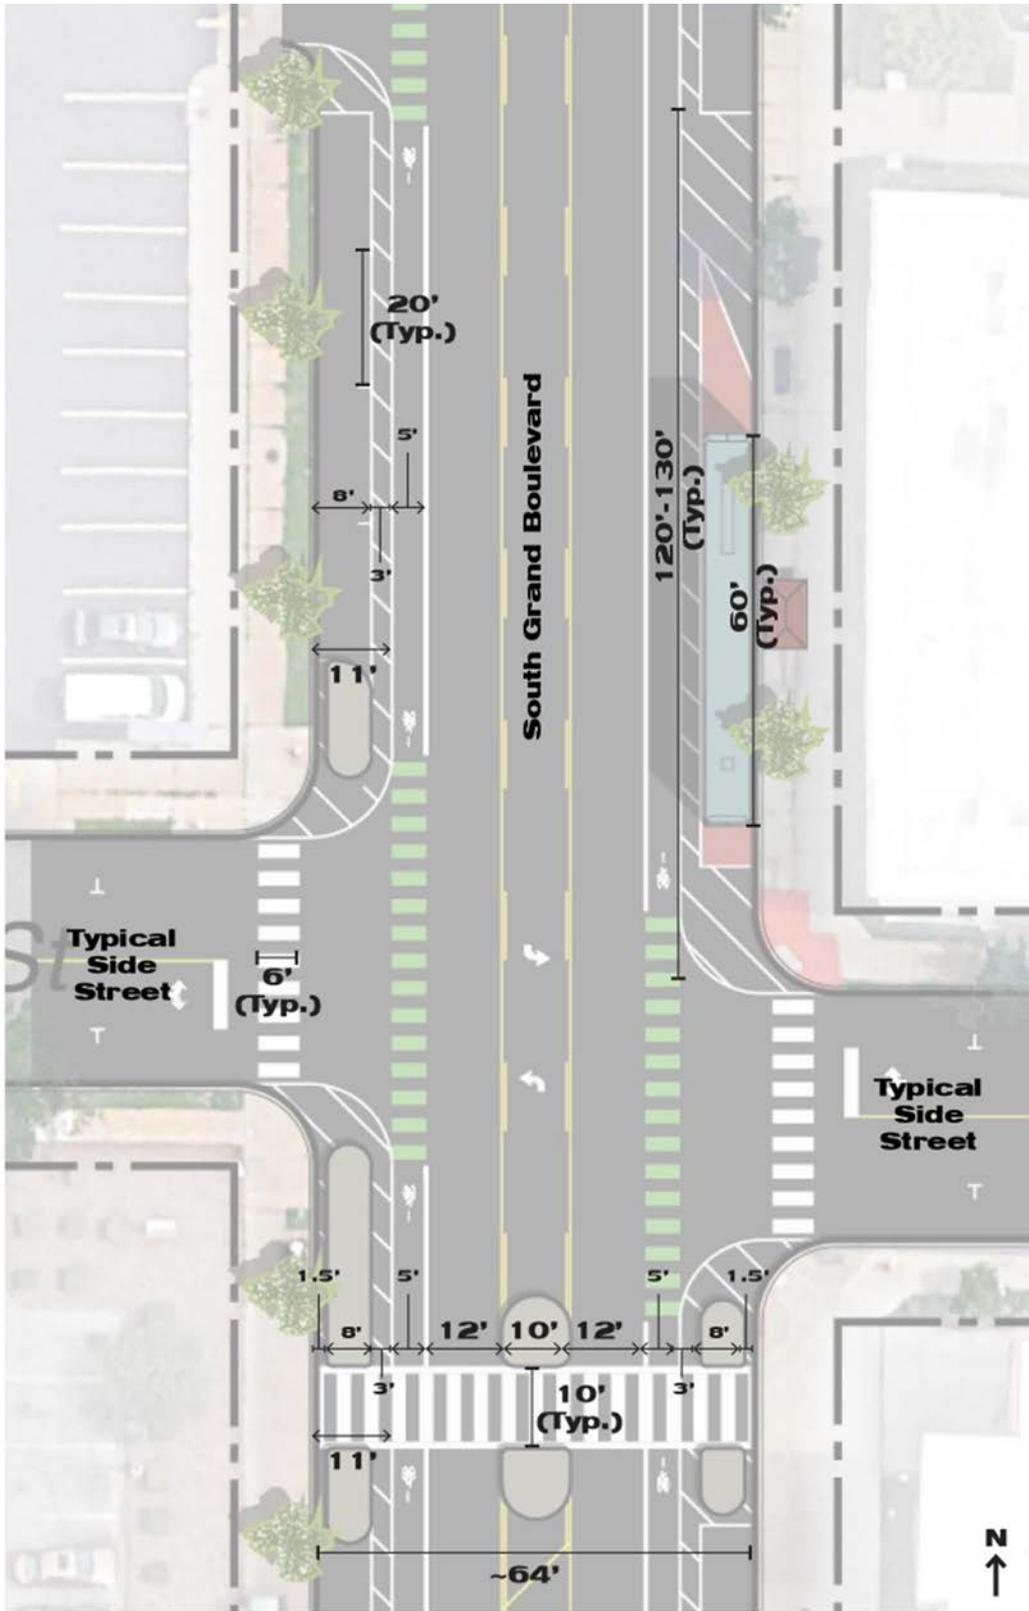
Option A and B Typical Section (Utah Street to Gravois Avenue)
